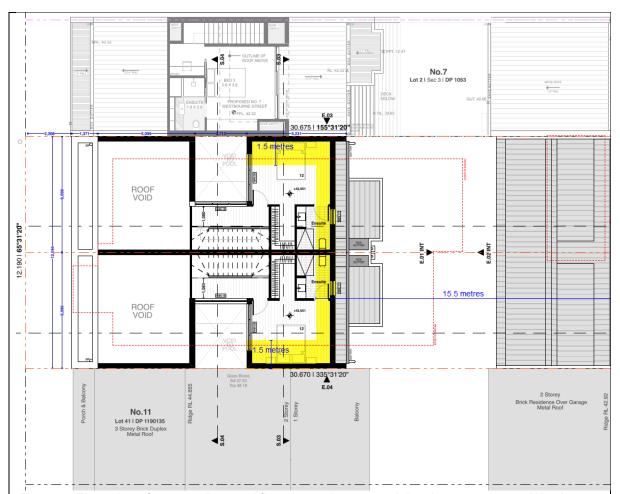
Floor plan of proposed second floor (centre), approved development at no. 7 Westbourne Street (top), and existing development at no. 11 Westbourne Street (bottom).
